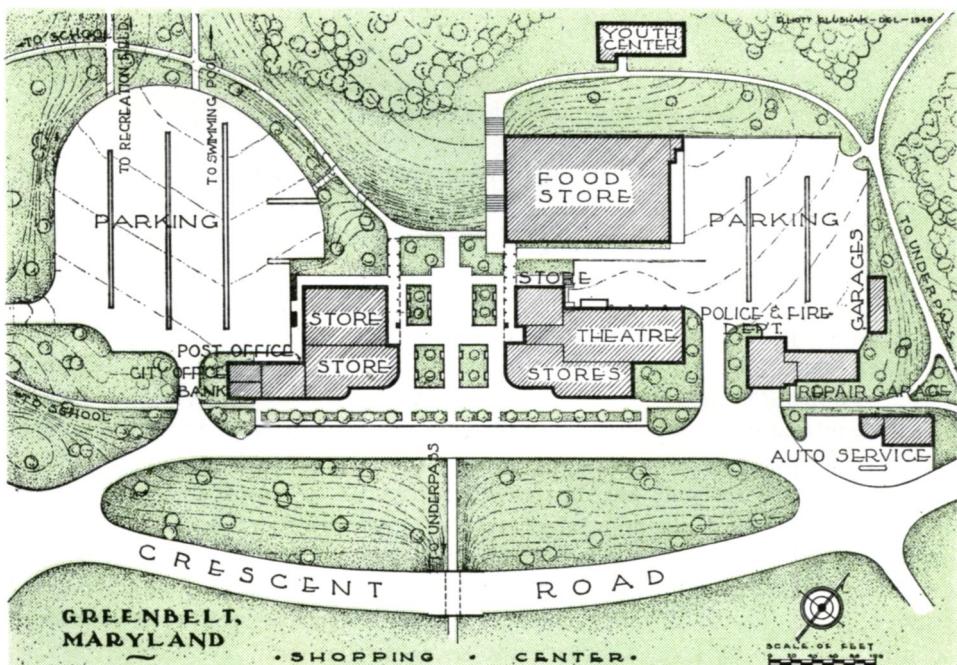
Plan of the Shopping Center at Greenbelt showing the new Food Store and Youth Center
